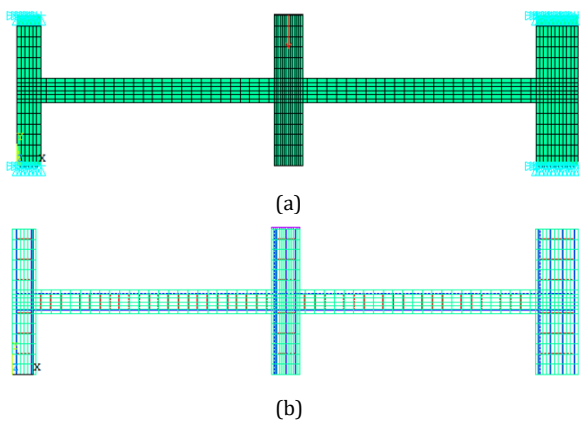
Finite element verification model, a) concrete elements and b) reinforcement elements.
